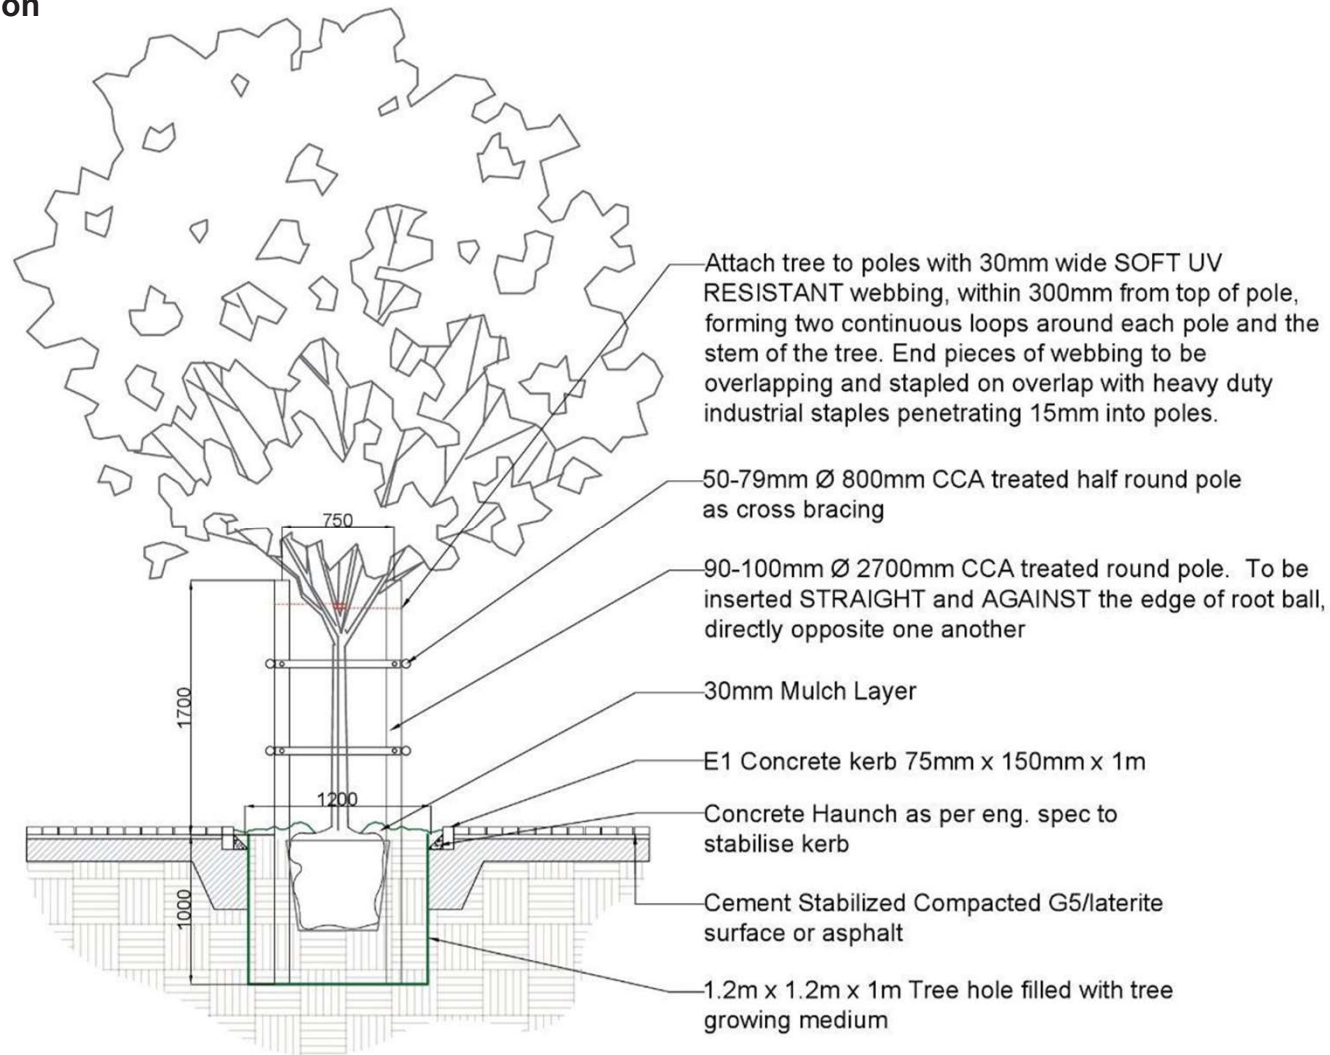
Hardscape Tree Detail Section (Viridian Consulting, 2024)
